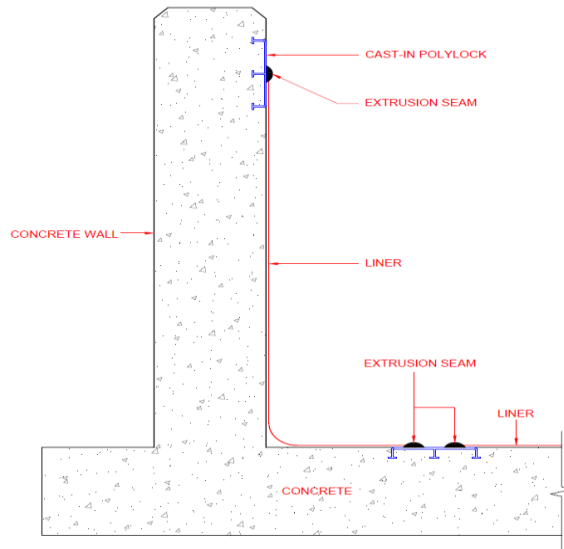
Cast-in Polylock and associated extrusion welds
